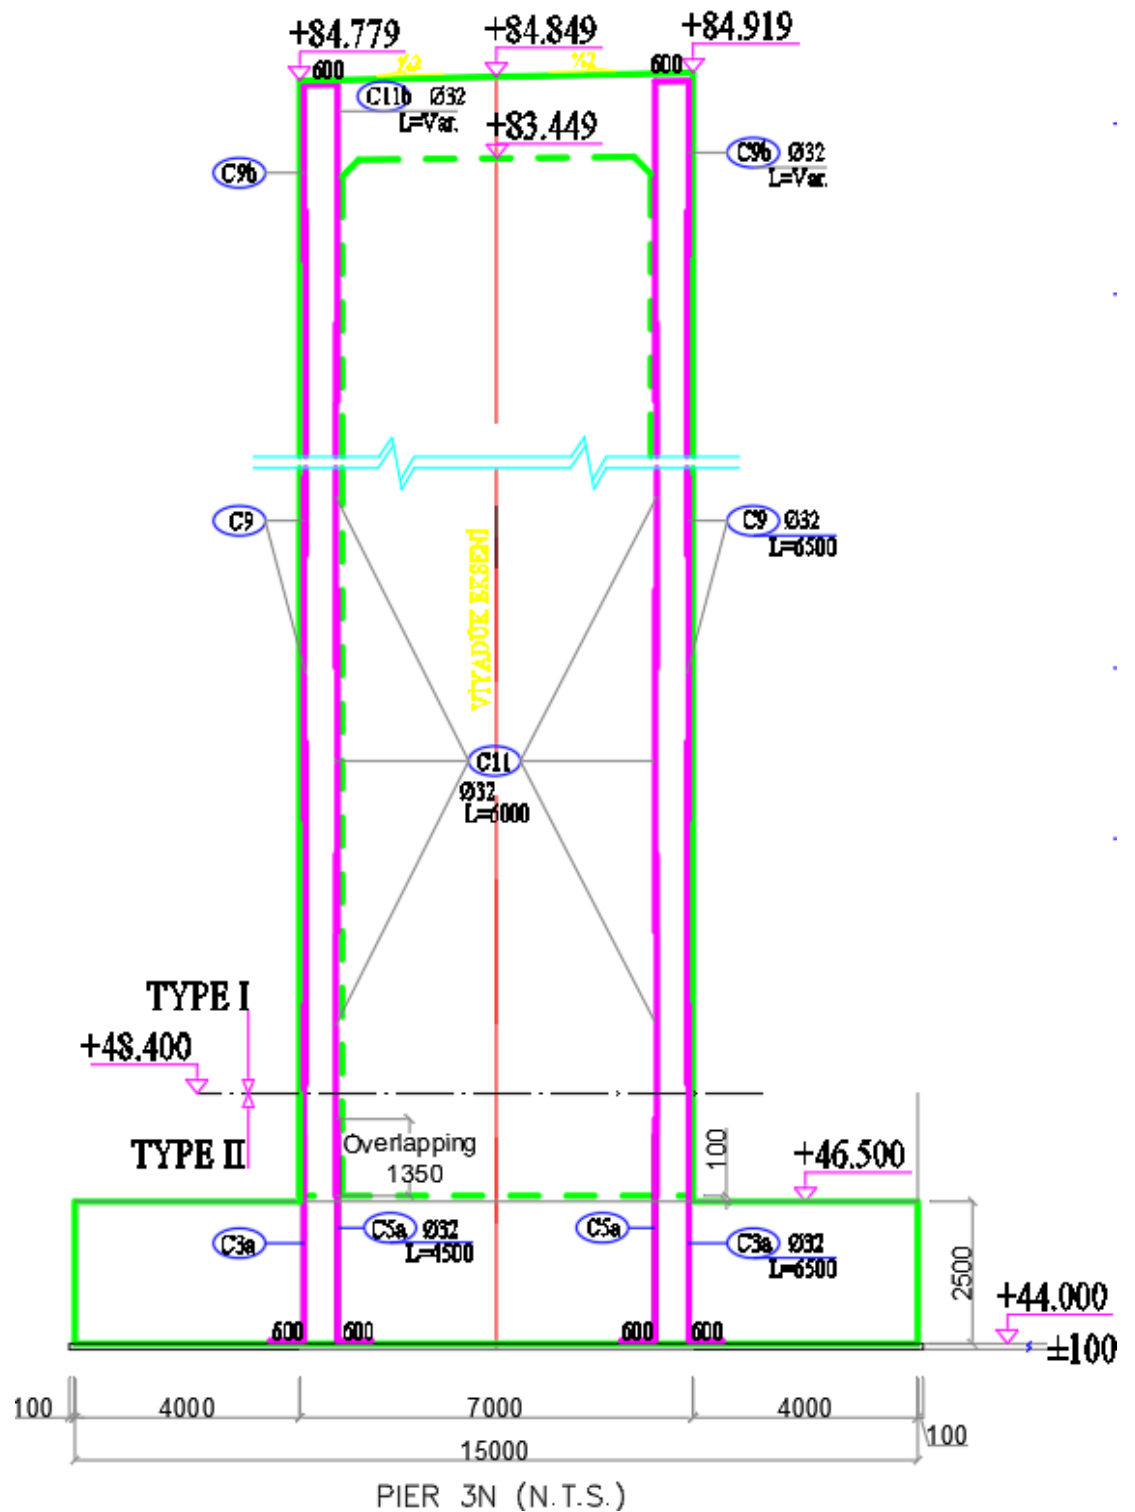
Typical Pier Section (North Viaduct Axis 3)
